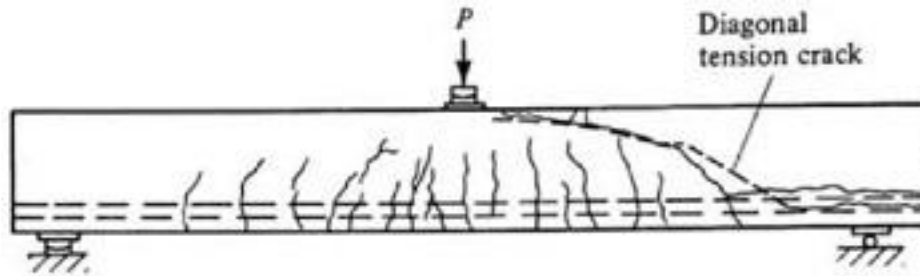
Longitudinally-reinforced beam without shear reinforcement
